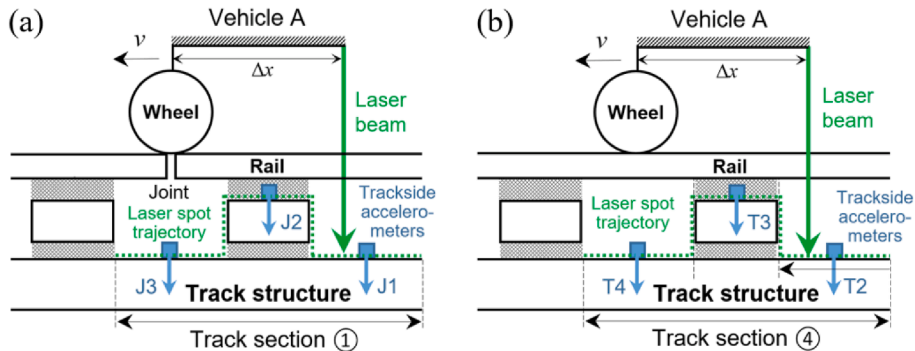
LDV and trackside measurement on two track sections. (a) Track section ① with a joint; (b) Track section ④ without joints.
